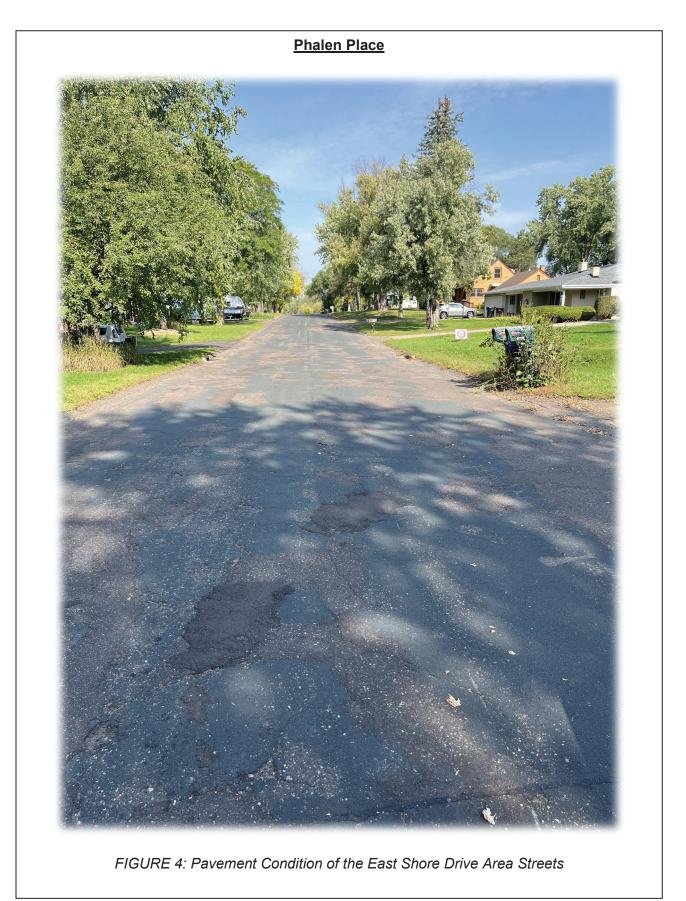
Pavement Condition of the East Shore Drive Area Streets
